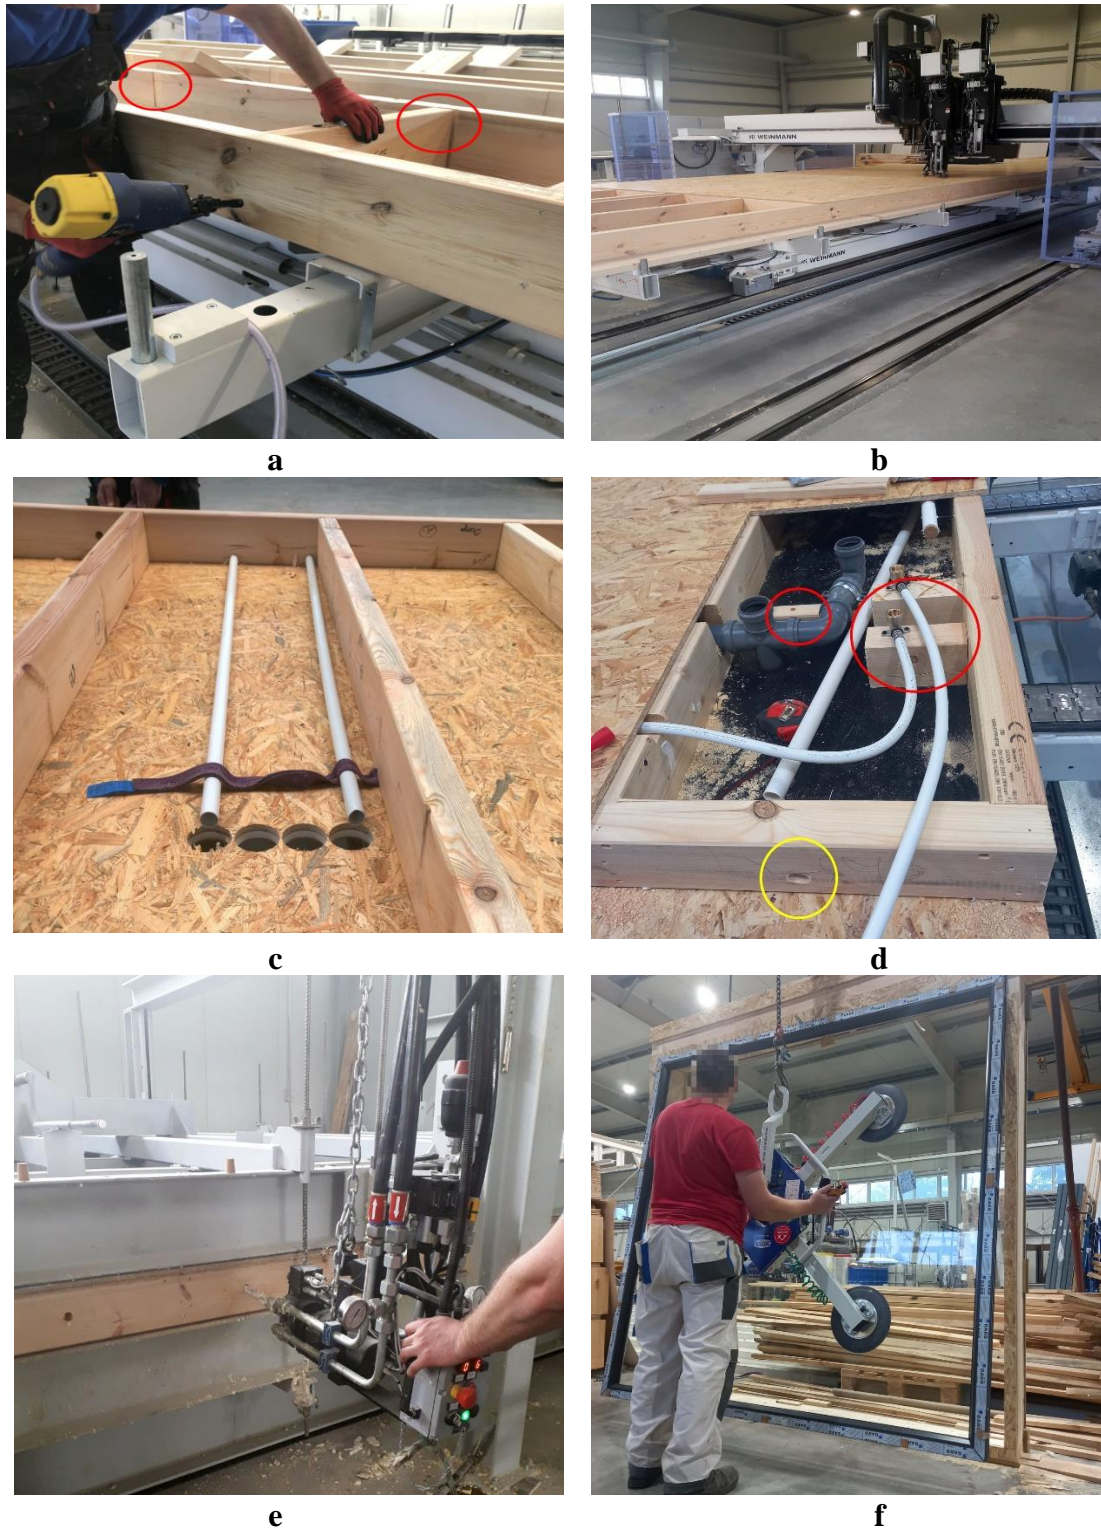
Production of prefabricates: a – construction of the wall frame using a pneumatic nail gun; b – automatic attachment of panels using carpentry centre No. 2; c – installation of electrical wiring piping; d – installation of water and sewage systems; e – process of polyurethane foam injection; f – Installation of the window in the external wall.
